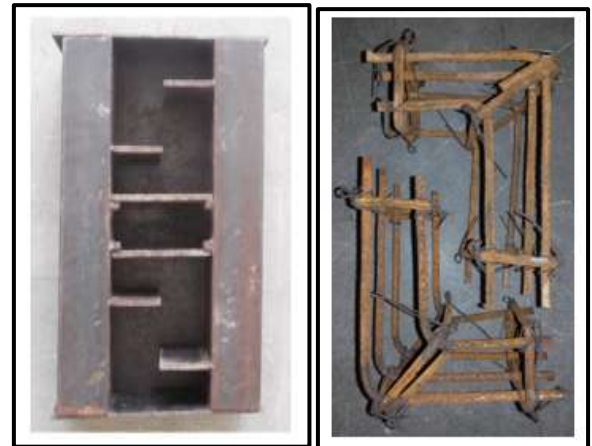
Mould for casting Fig 4: End-block reinforcement push-off specimen
